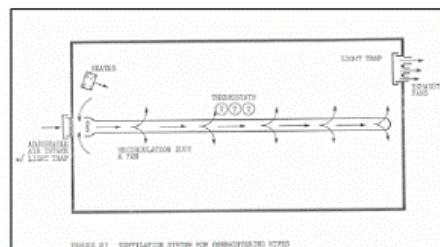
A simplified schematic of the ventilation, exhaust and heating systems used in indoor wintering buildings. Notice that all exhausts are equipped with light traps to ensure that no light enters the building. Although lights disturb indoor wintering bees, beekeepers employ red lights, which are invisible to bees, for routine maintenance. The recirculating fans and ducts ensure that air in the building is well mixed. The heater is only used when outside temperatures are so low that the heat generated by the bees can no longer maintain the room temperature at 5°C.
